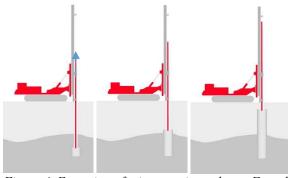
Execution of a jet-grouting column. From bottom to top, withdrawal with rotation while de cement slurry is injected.
